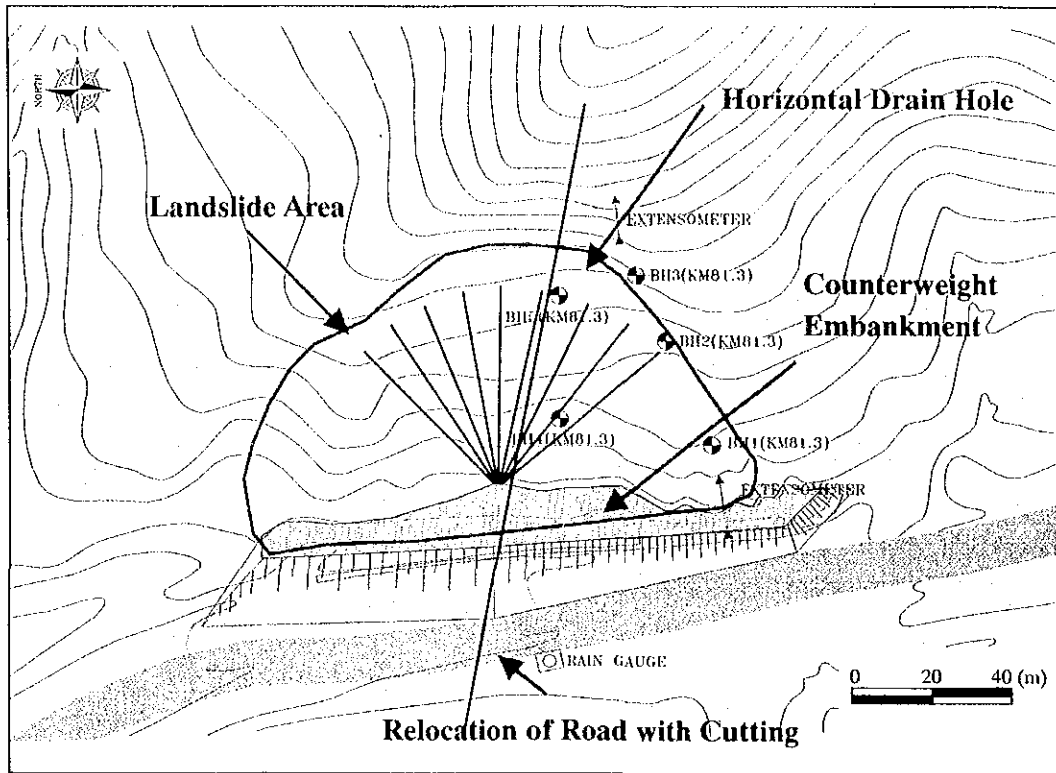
Plan of counterweight embankment at CH 81.30 km.
